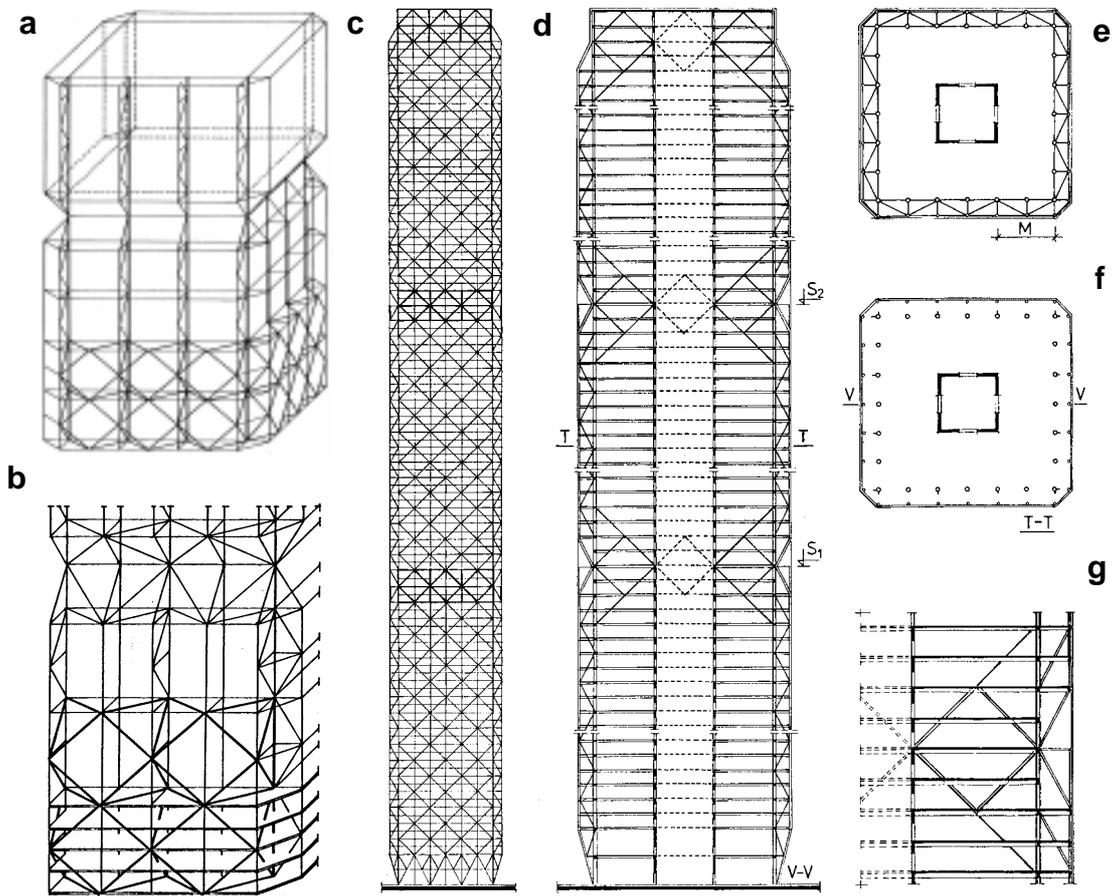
General schemes of the structural system of a tall building having the perimeter support structure of the form of vertically positioned {D – O} space frame, a) overall view of localization of two segments of a circumferential structure, b) detail of arrangement of sets of typical storeys, c) elevation, d) the main vertical cross-section, e) horizontal cross-section of the main structure, f) horizontal cross-section on level of the typical storey, g) vertical cross-section of a boundary area between two vertical segments
